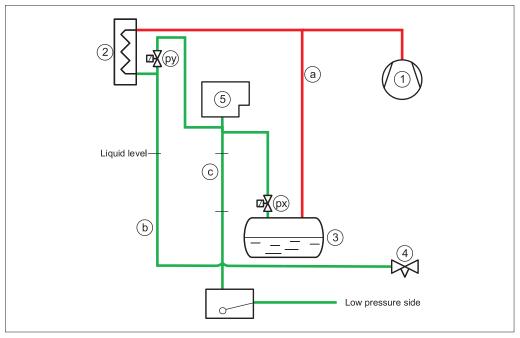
Purger connections (px) & (py). Drain piping (c) must be vertical/downward slope
